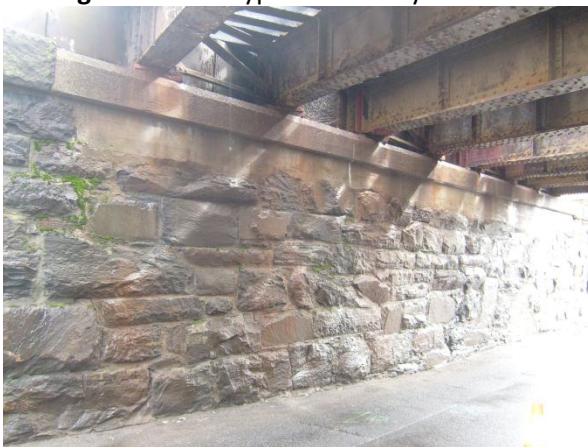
Masonry abutment with concrete bridge seat
